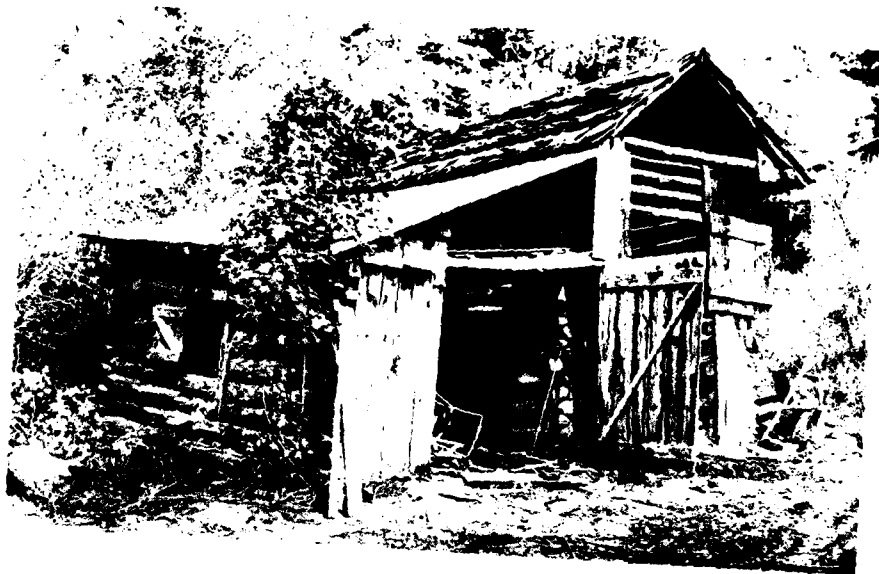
General view of Building 2, Tract.411. Note shake roof.
